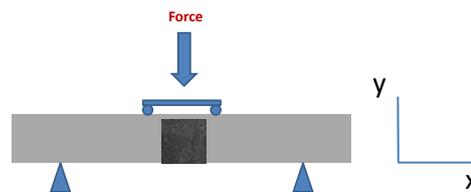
Four point bending test on reinforced steel beam with 30cmx30cm digital pattern directly sprayed onto concrete surface
